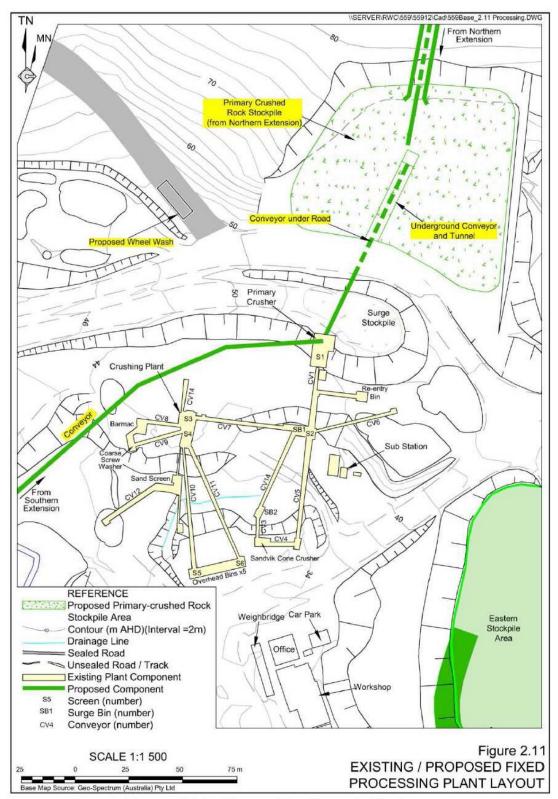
Existing / Proposed Fixed Processing Plant Layout
